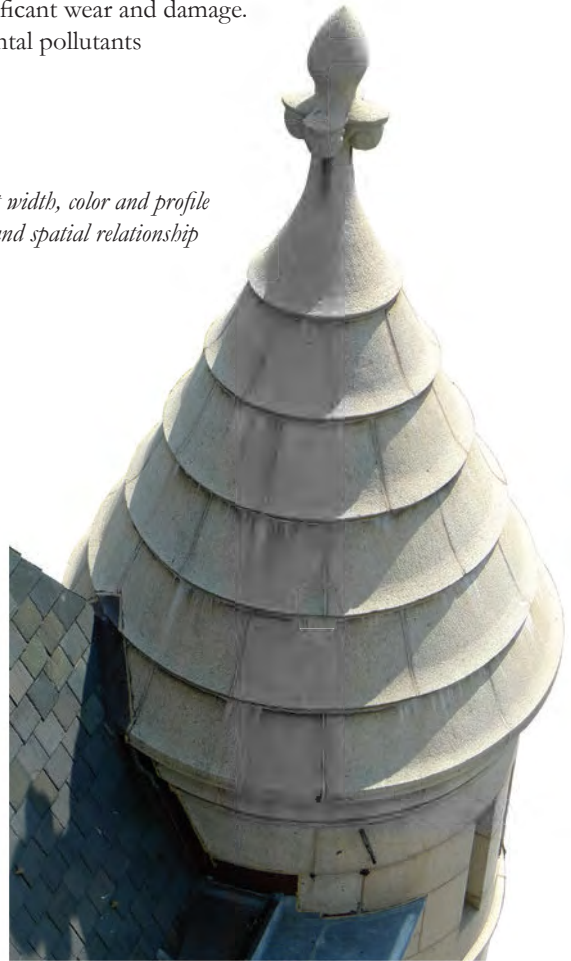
Detail Roof Corner Turret, 2012. Photo Courtesy GSA.
